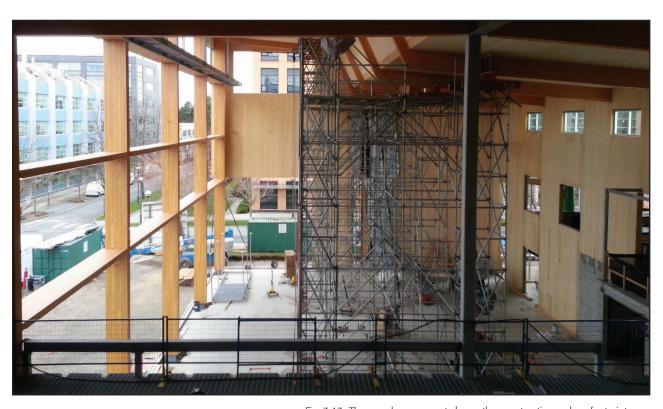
The wood components lower the construction carbon footprint of the building, compared to concrete or steel construction
